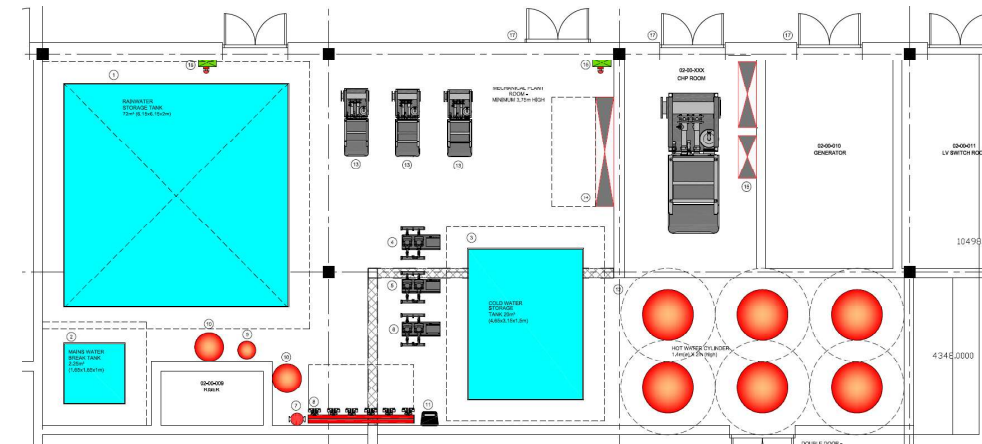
Proposed Hotel Ground Floor Plant Area
